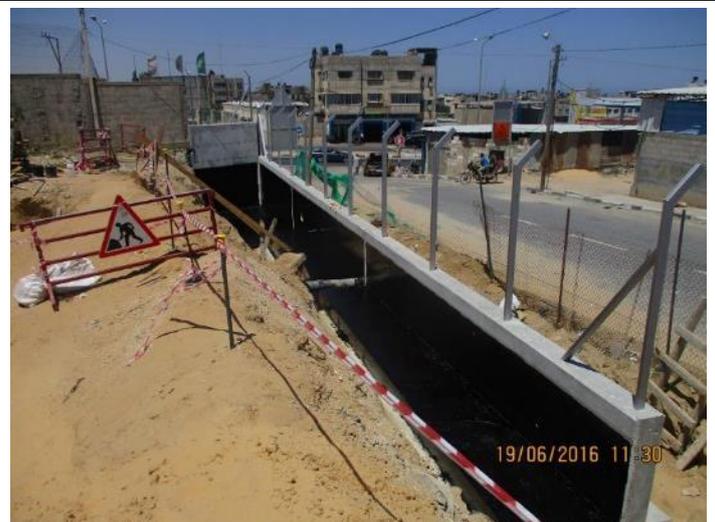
(Casting Concrete for the RW Walls for Part (A) of Segment (6-6A) Part (B) of Segment (6-6B)
